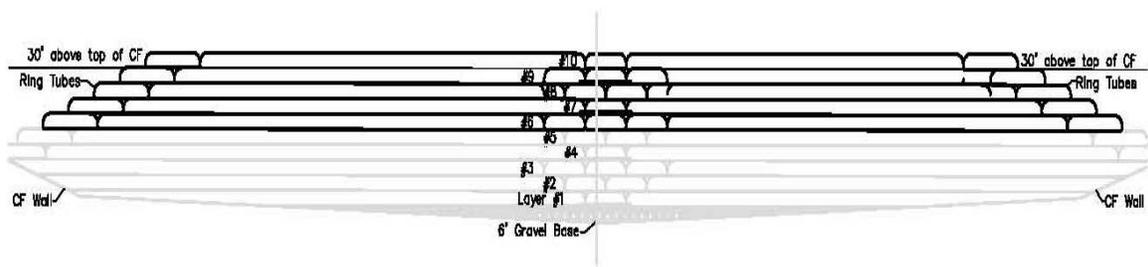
a: Phase II pre-construction geotextile tube layout plan, cross-section, 140 ft north of the weep water sump.
